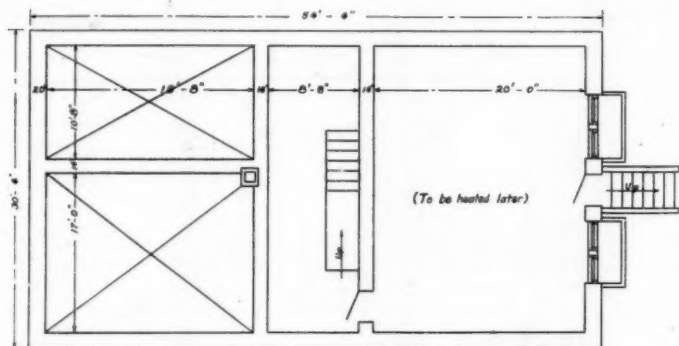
PLAN OF CONSERVATORY BASEMENT.
